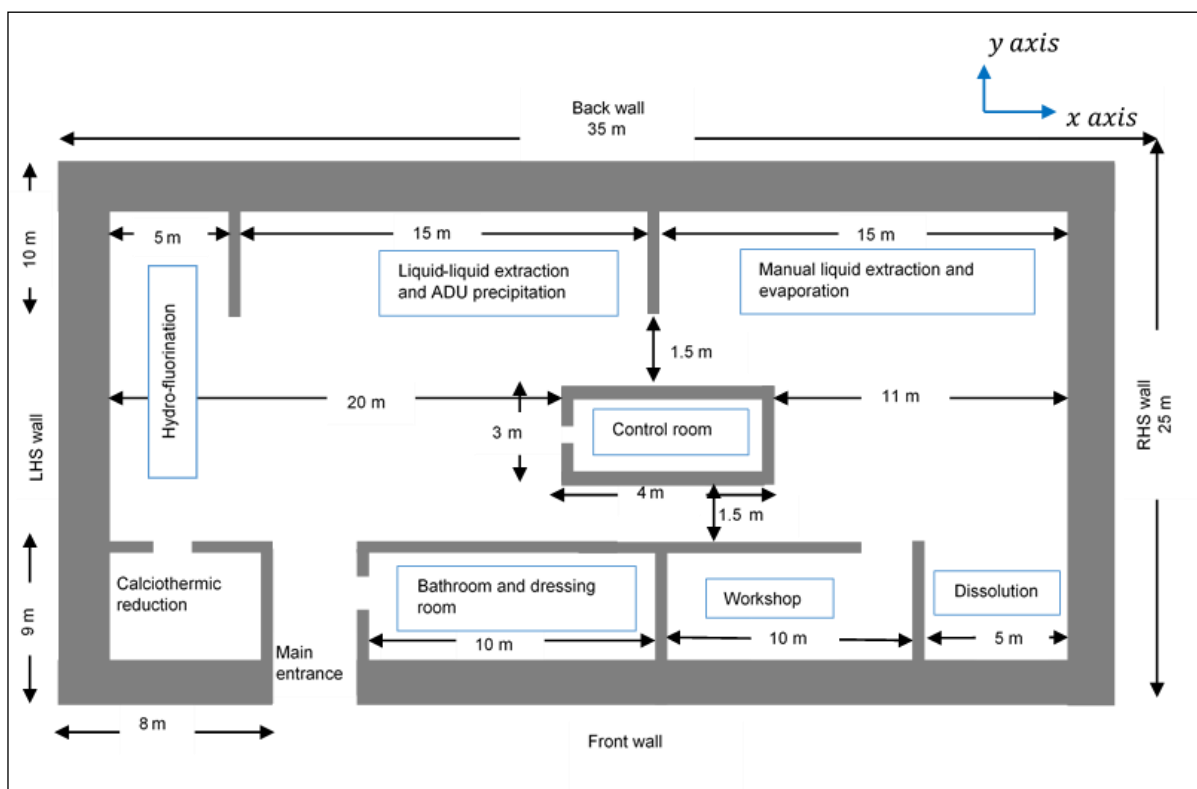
Top-view, i.e., x-y plane view of the originally planned layout of the PUREX uranium processing facility, showing the processing workstations, administrative areas and the biological shielding walls, made of ordinary concrete.
